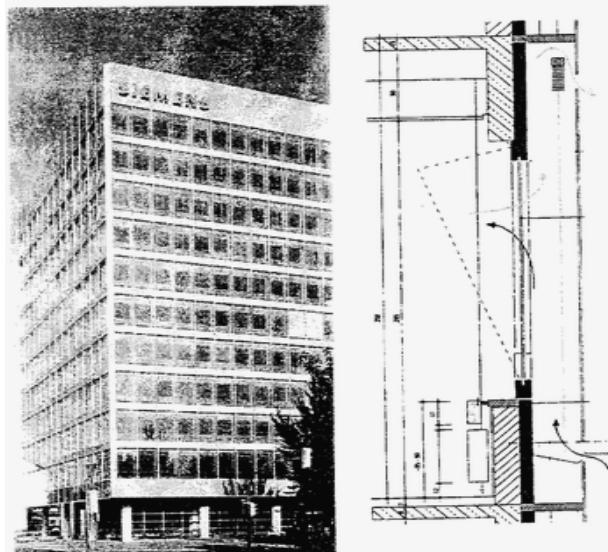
Natural ventilation of tall buildings with double façades (Siemens building, Dortmund) /2/
